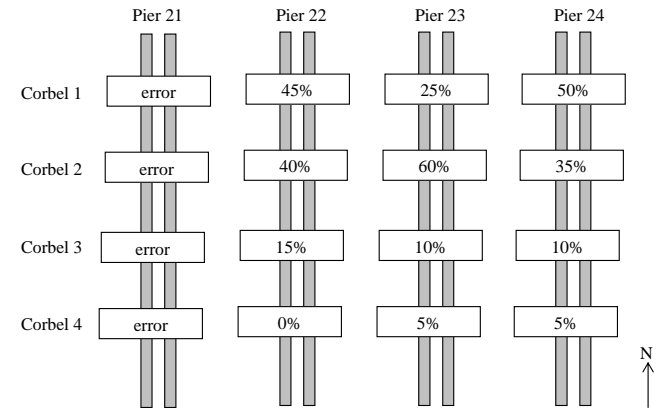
Load distribution between corbels in Goomalling end piers (pier - north loading).
